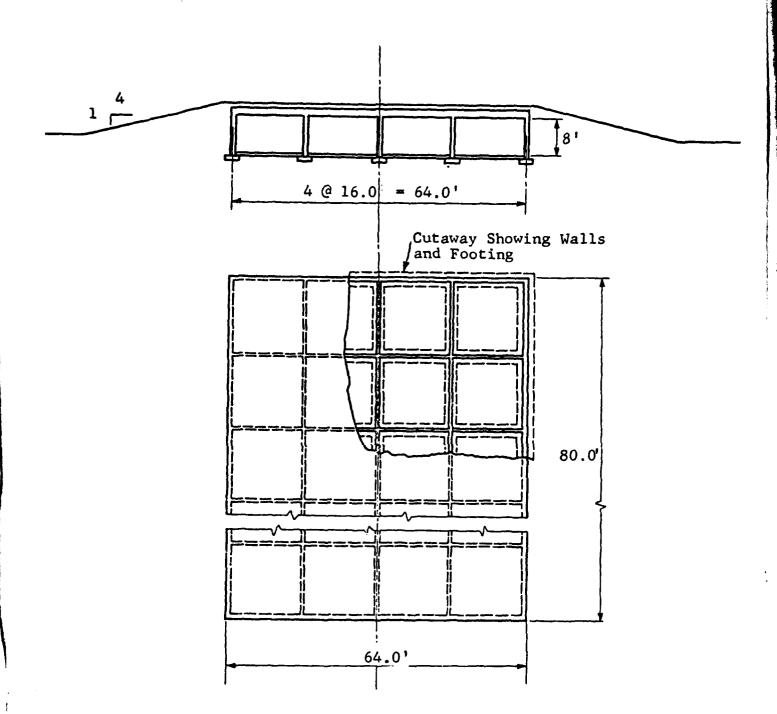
Basic (500-Man) Reinforced Concrete Rectangular Shelter Module [Ref. 3]
